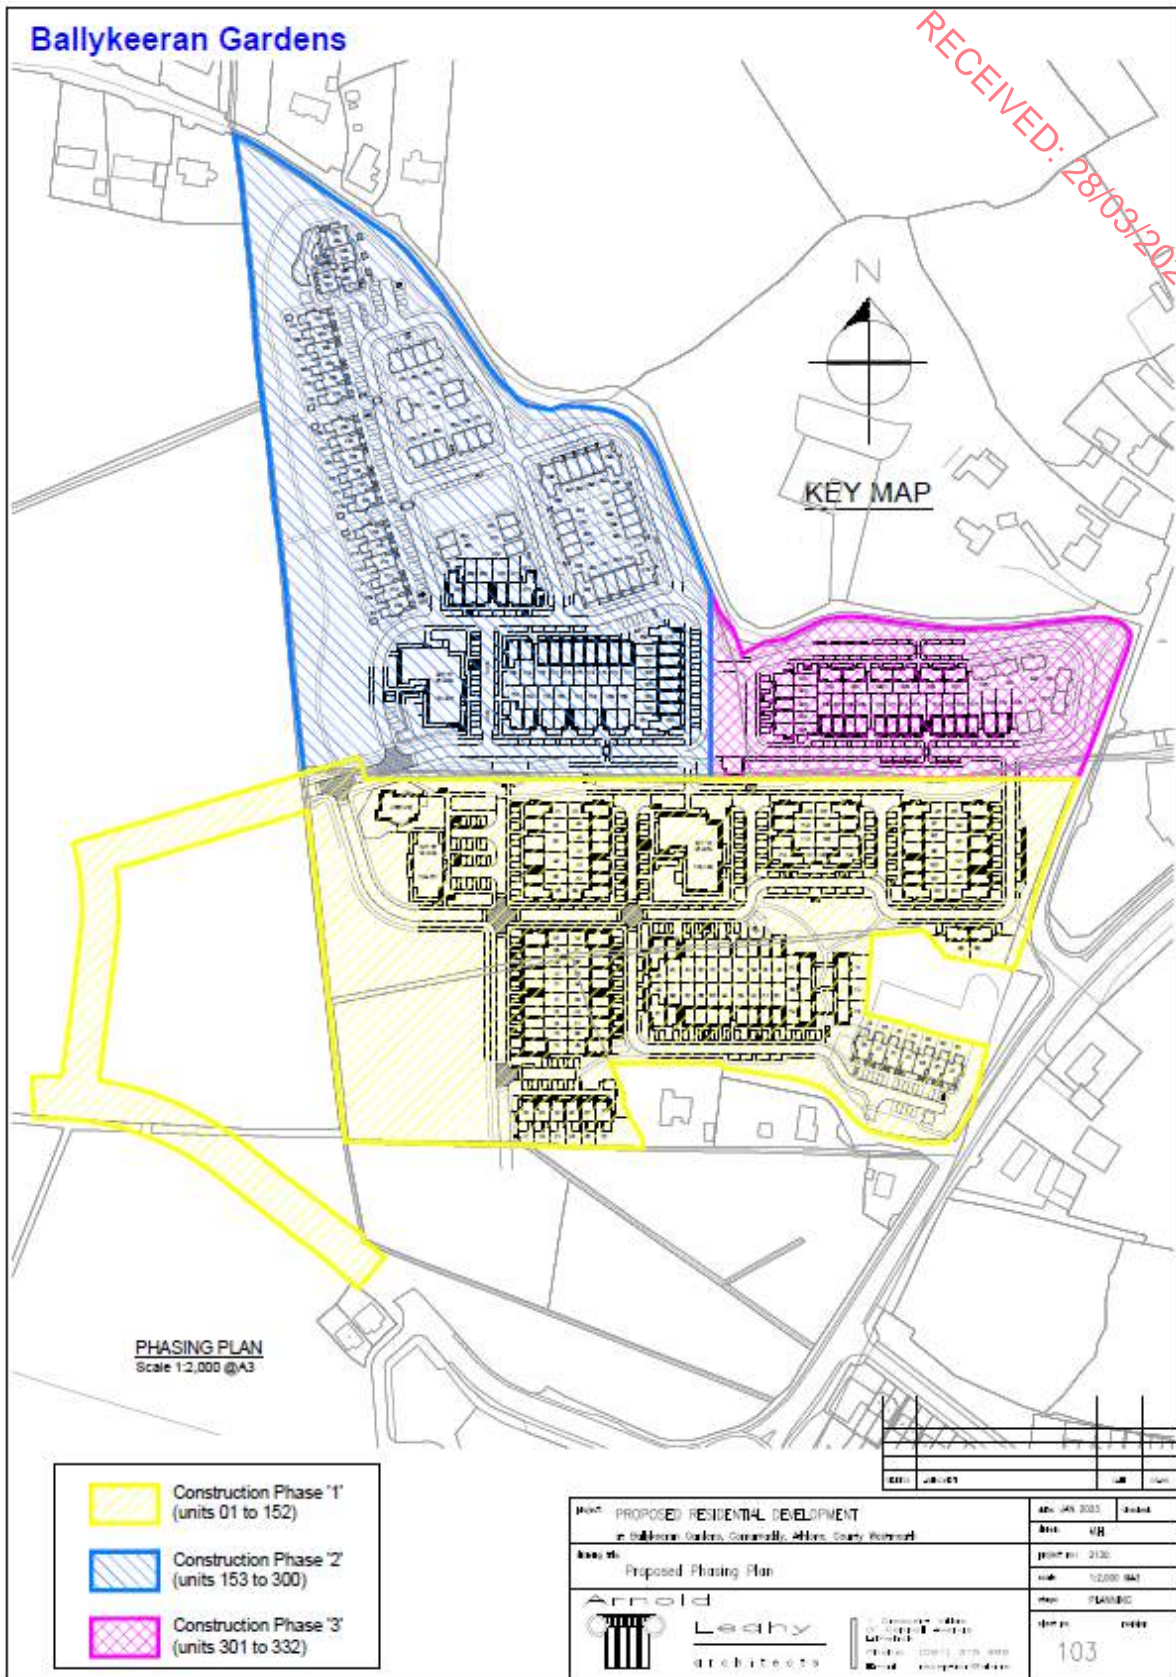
Phasing Plan (Arnold Leamy Architects, January 2023)
